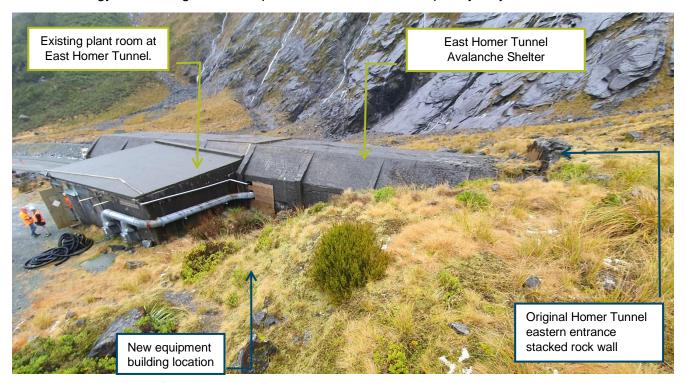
view southeast from above Homer Tunnel eastern portal and new equipment building site.
